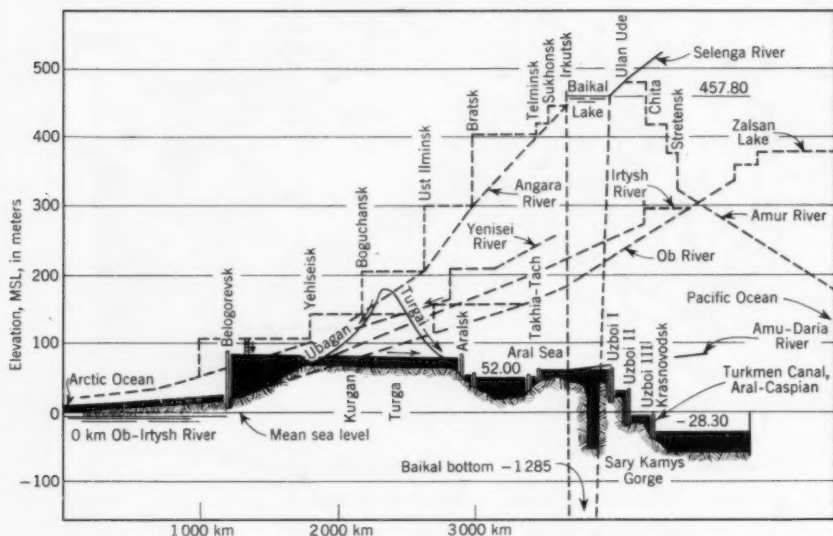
DAVIDOV PLAN ELEVATION SCHEME
